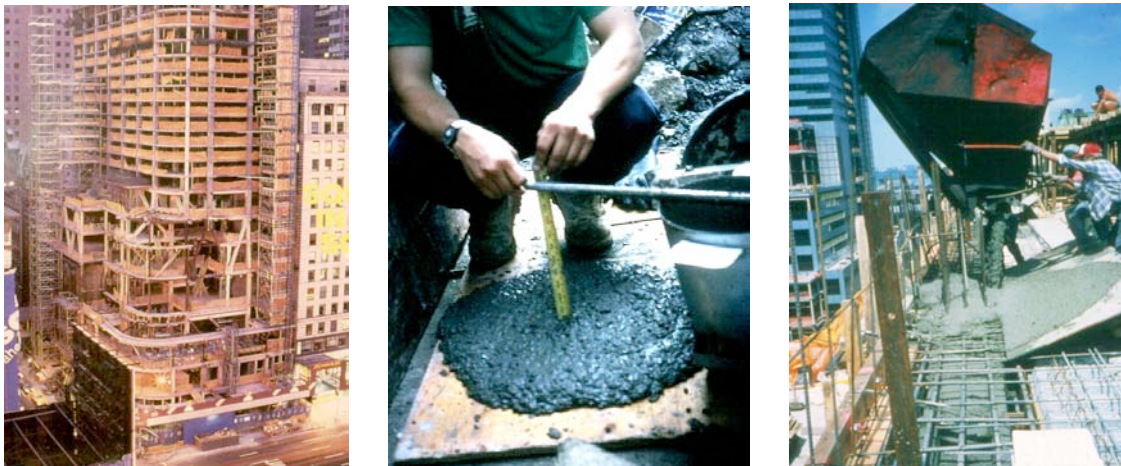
Embassy Suites Tower & Hotel; flowing silica fume concrete and adapted placemen procedure
